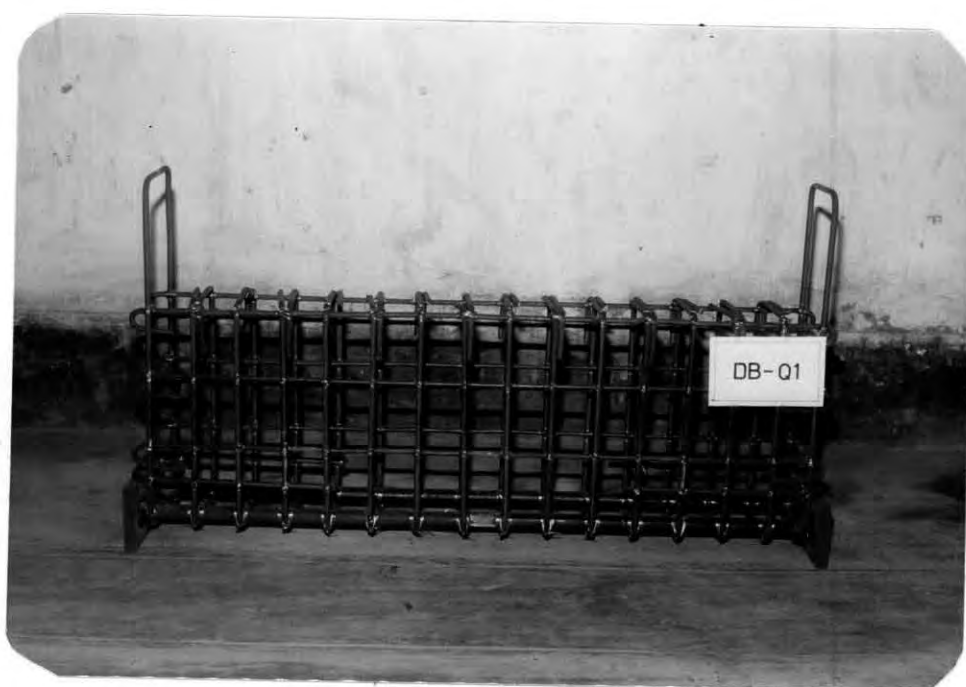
Reinforcement Assembly for Beam DB-Q1
